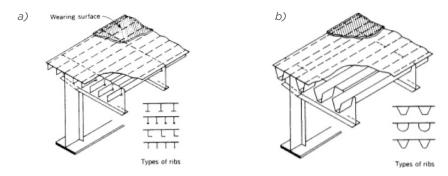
Two basic types of steel plate bridge deck, (Chen & Duanbridge, 2000) a) Deck with open ribs; b) Deck with closed ribs
